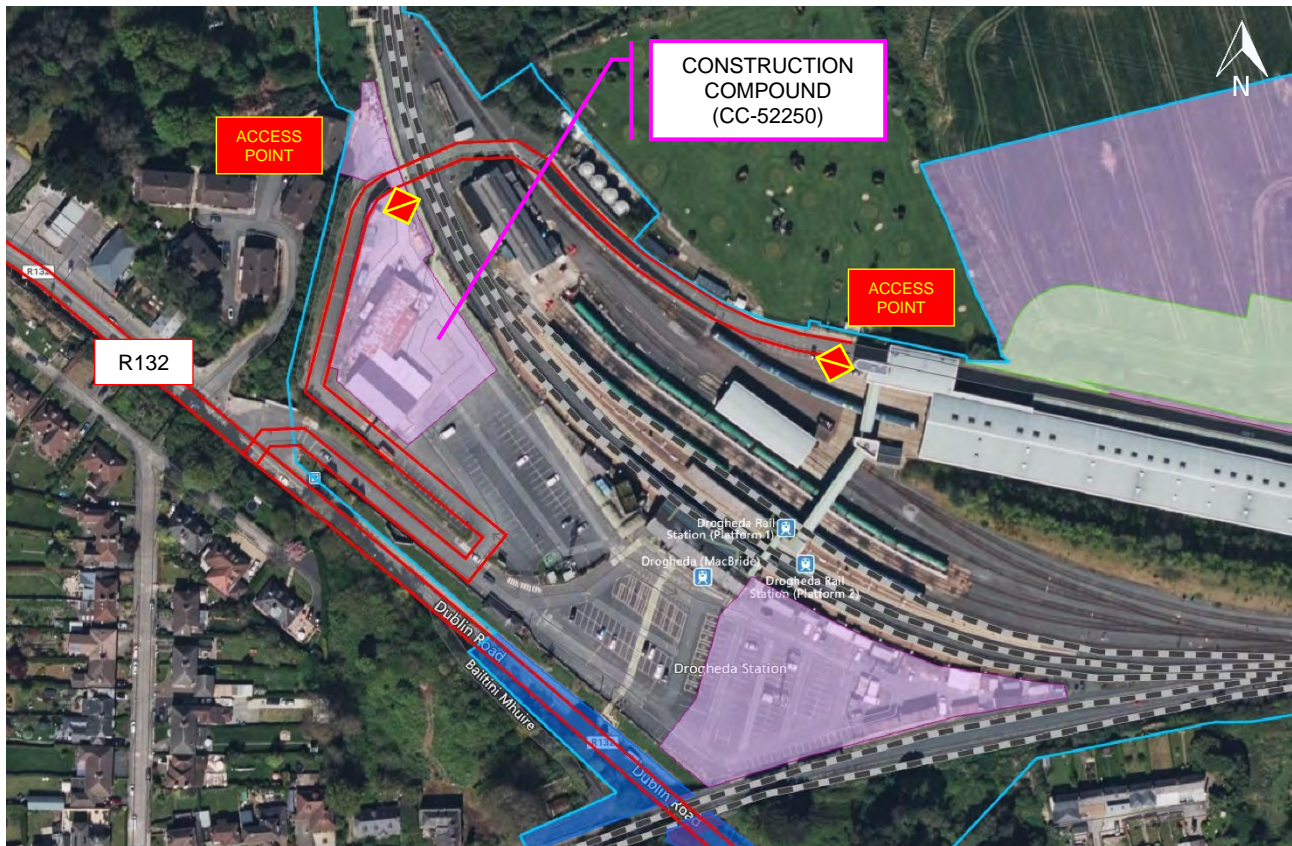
Drogheda Depot – Proposed Construction Compound and Access Route
